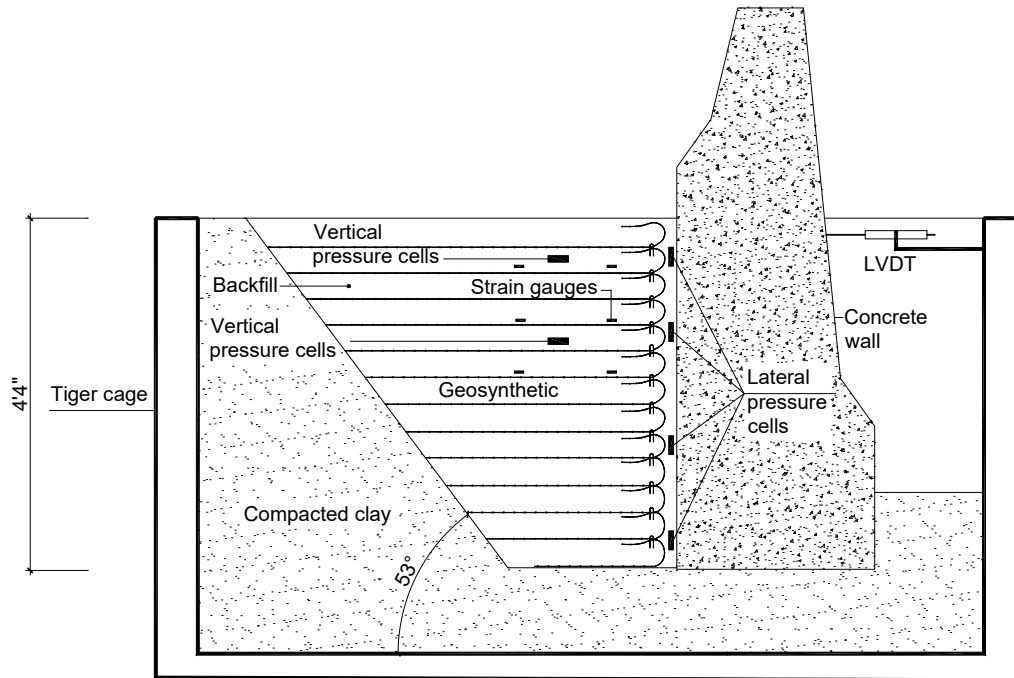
Model test of GRS wall with 4" spacing of wrapped around geosynthetic with (Test 4)
